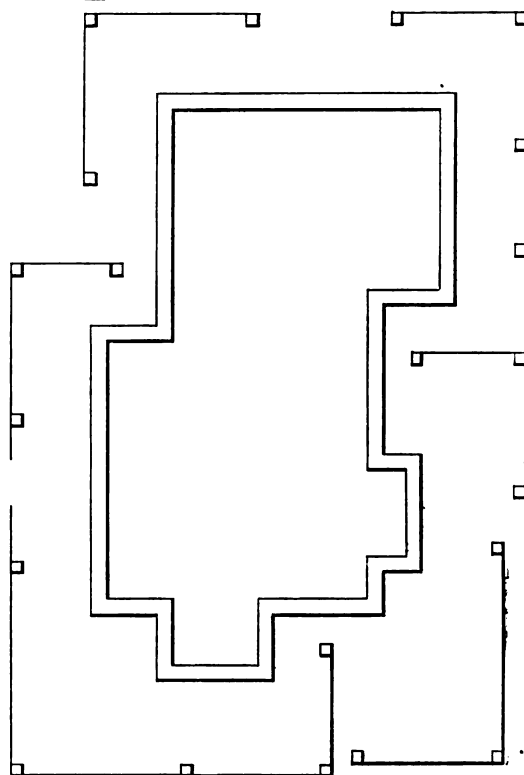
Foundation Plan, Showing "Batters" Laid Out.
